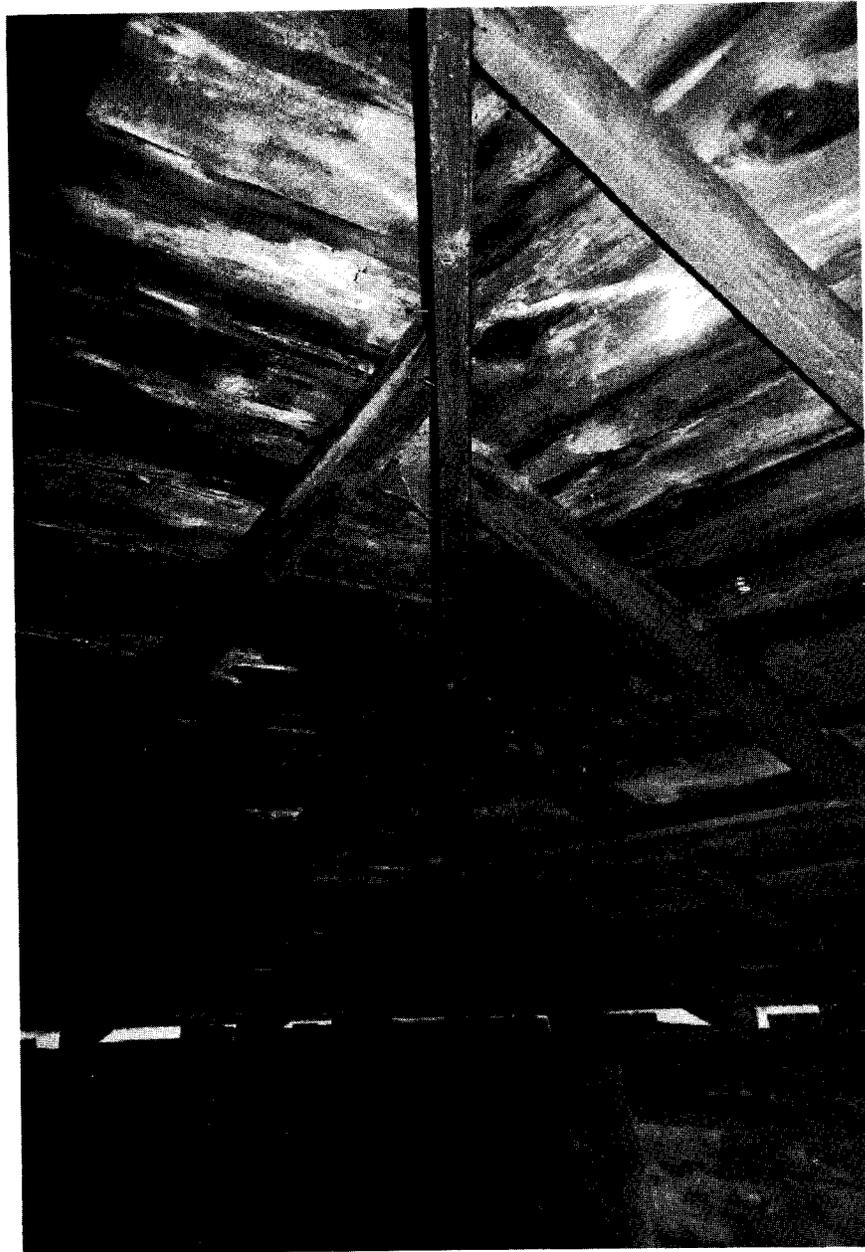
Penniman House: Unfinished Attic Space (Room 301), Framing of Hip of Upper Section of Mansard Roof (1984).
